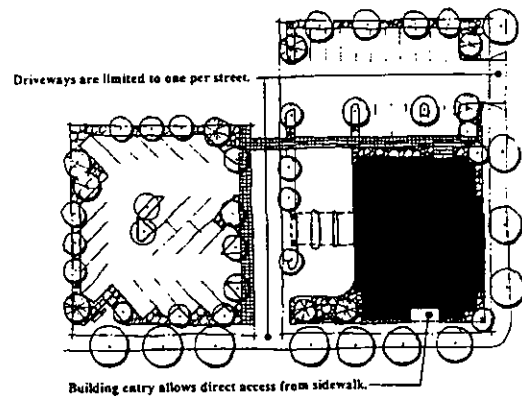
Parking Lot Location and Design Criteria (a) and Vehicles Entrances Criteria (a). The building location at the corner and minimizes the visual impact of the parking lot.
